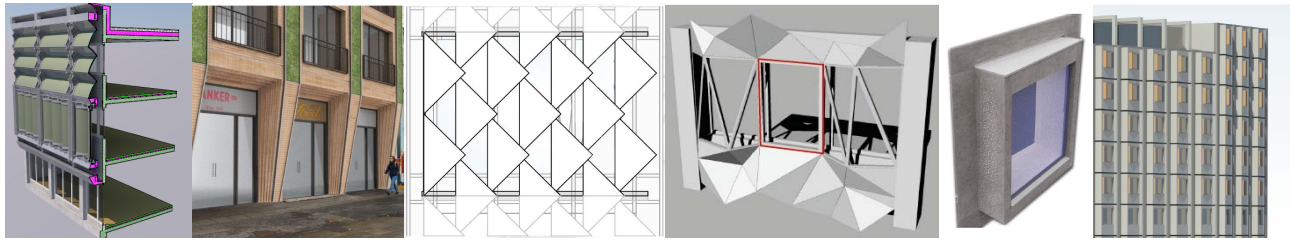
Six different concepts toward façade retrofit for the building at Schwedenplatz, Vienna
